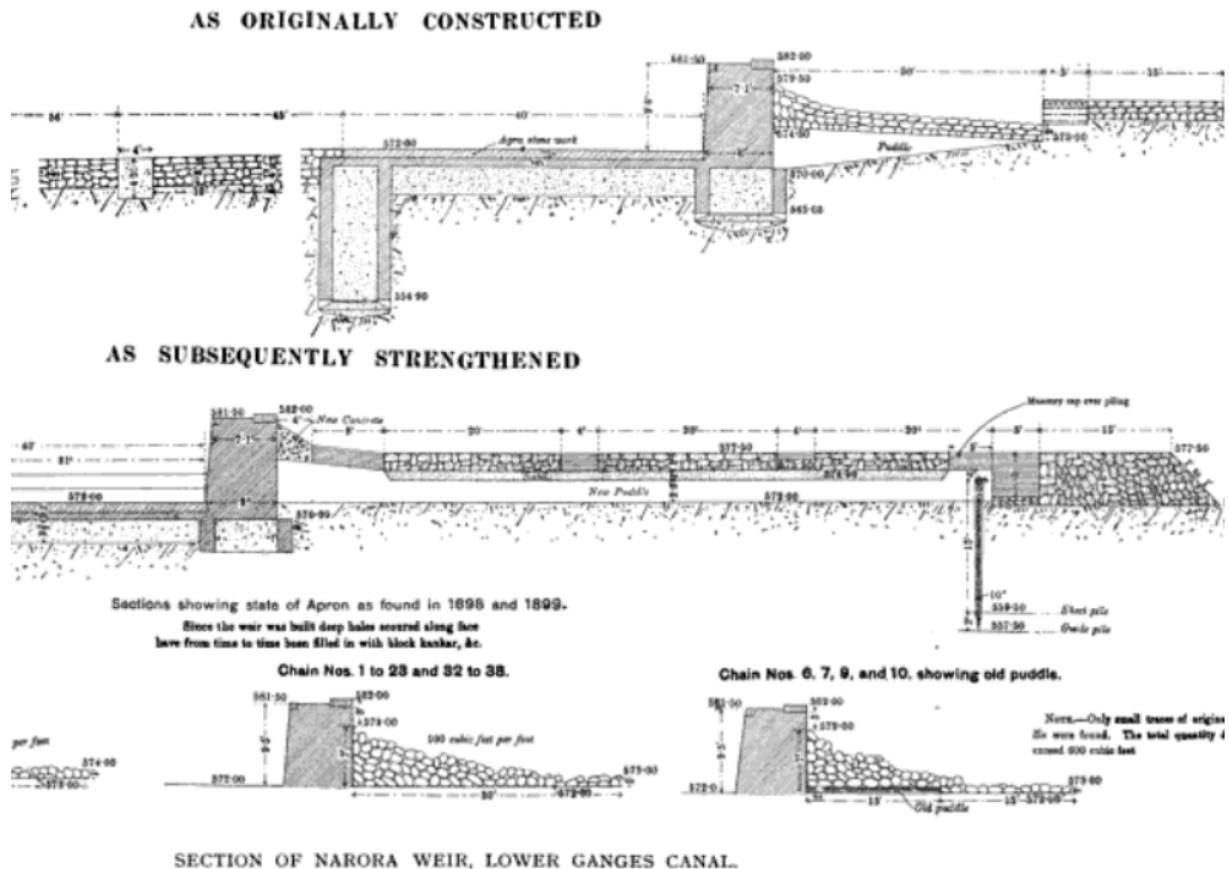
Pre-failure and repaired sections of Narora weir (Buckley 1905). Note how the seepage path was significantly lengthened in the repaired section and the addition of an upstream, sheet pile cutoff wall.
